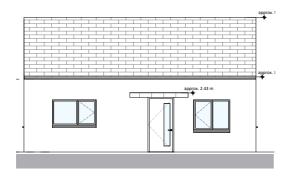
2-Bed Unit Front Elevation (not to scale)
